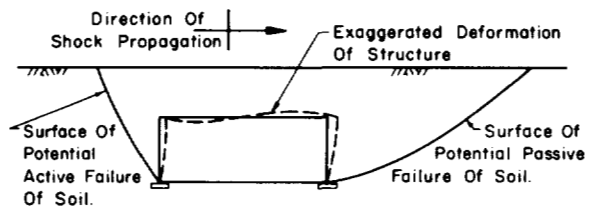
POTENTIAL SURFACES OF FAILURE IN SOIL SURROUNDING A STRUCTURE
